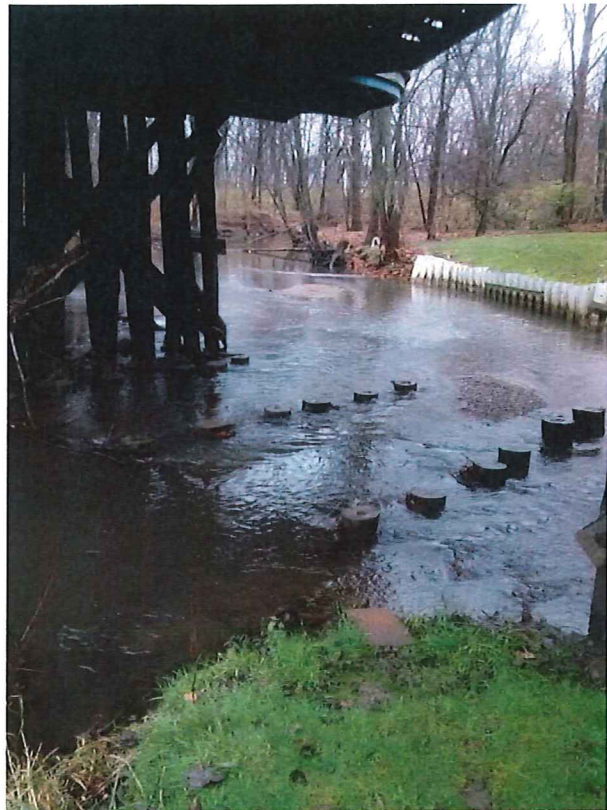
(Section 2 – south bank looking downstream): Shallow area under bridge with posts embedded in ground
